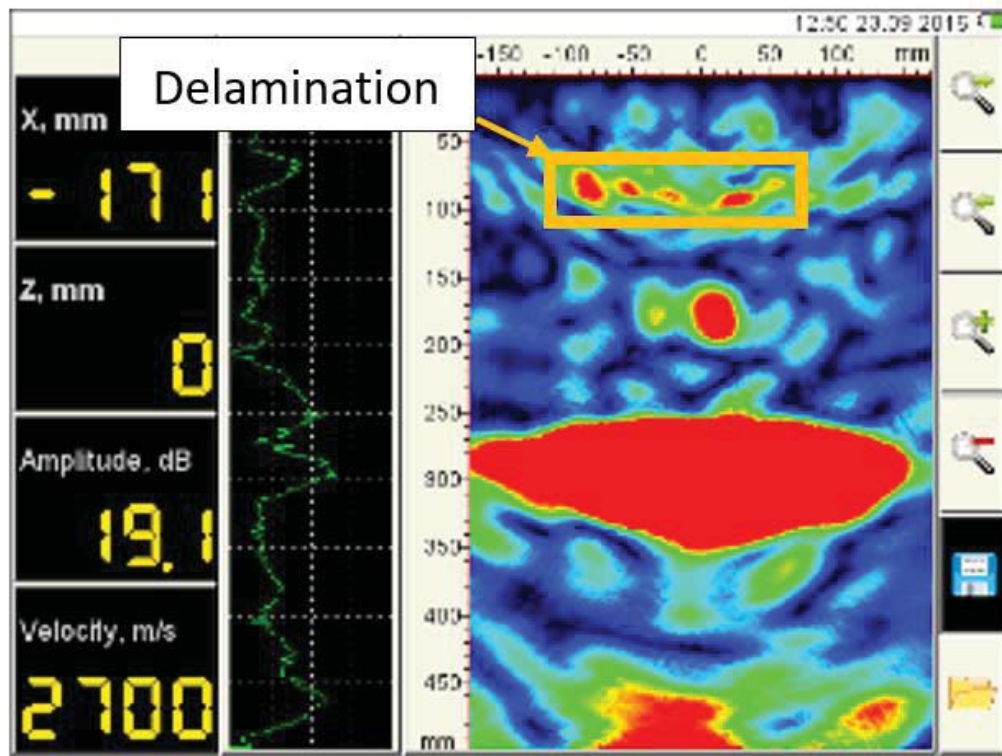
Stadium Drive B-scan showing potential voids/delamination and misaligned dowel bar and slab depth at 290 mm(11.4 in.). Units of the plot are in millimeters, 1 in. = 25.4 mm.
